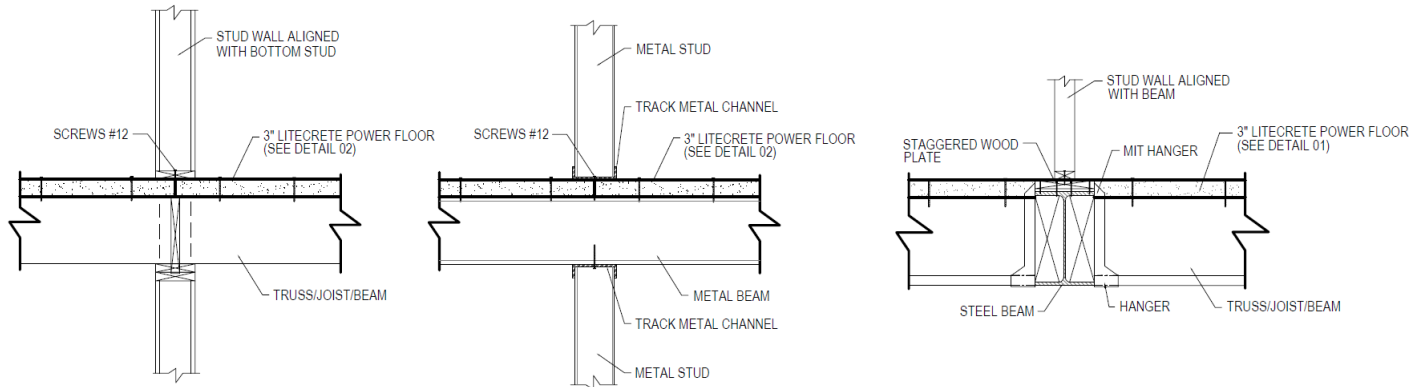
LITECRETE POWER FLOOR SYSTEM CONNECTIONS
